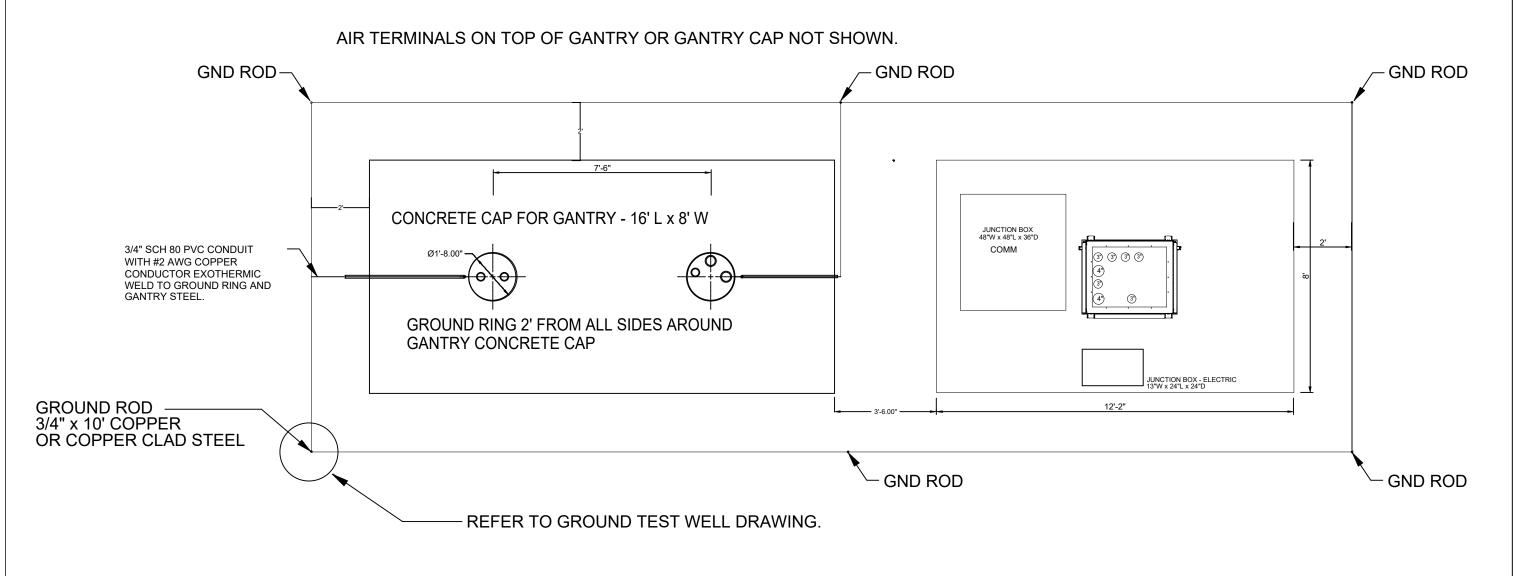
DETAIL "A" - AET SHELTER BUILDING GROUND RING N.T.S.
